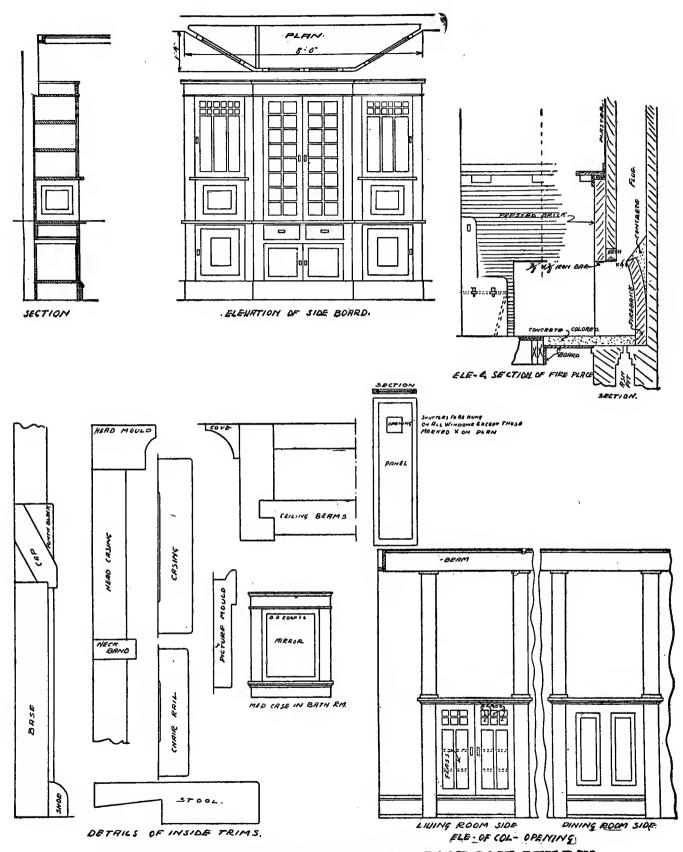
COLUMNED OPENING WITH BOOK CASE BUILT-IN
